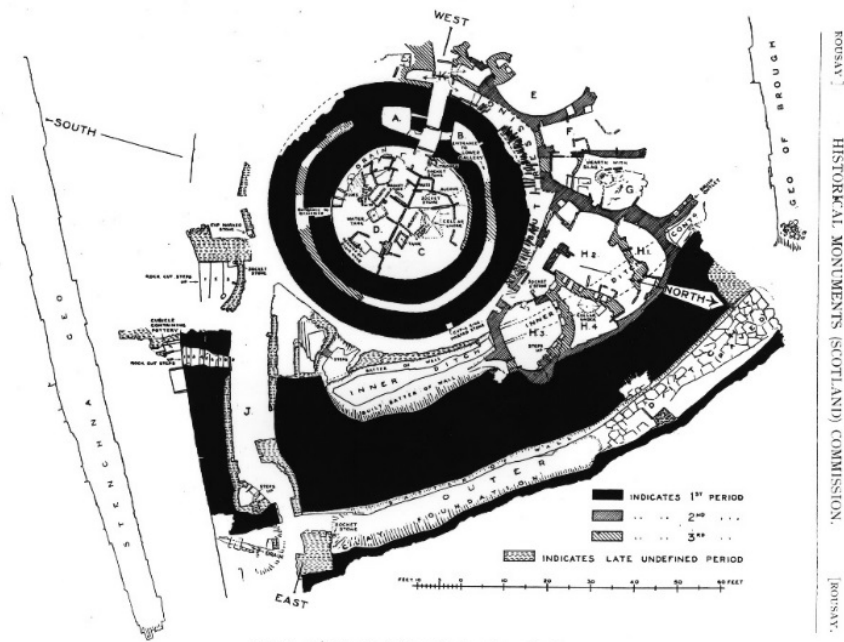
Mid Howe Broch (No. 553); plan at ground level.
